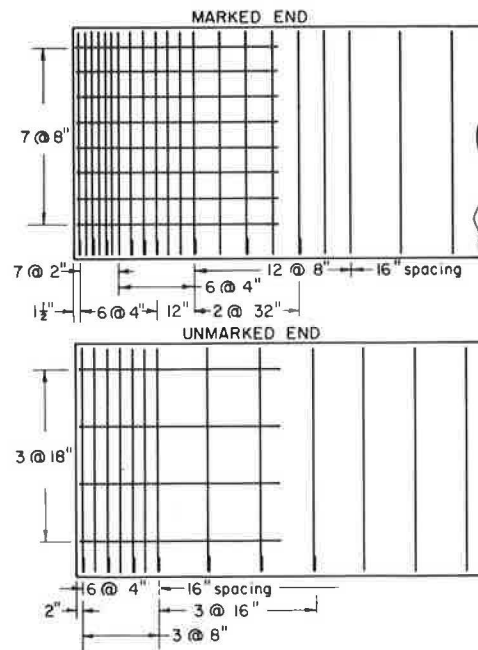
Steel reinforcement at the ends of Series 14 test girder.
